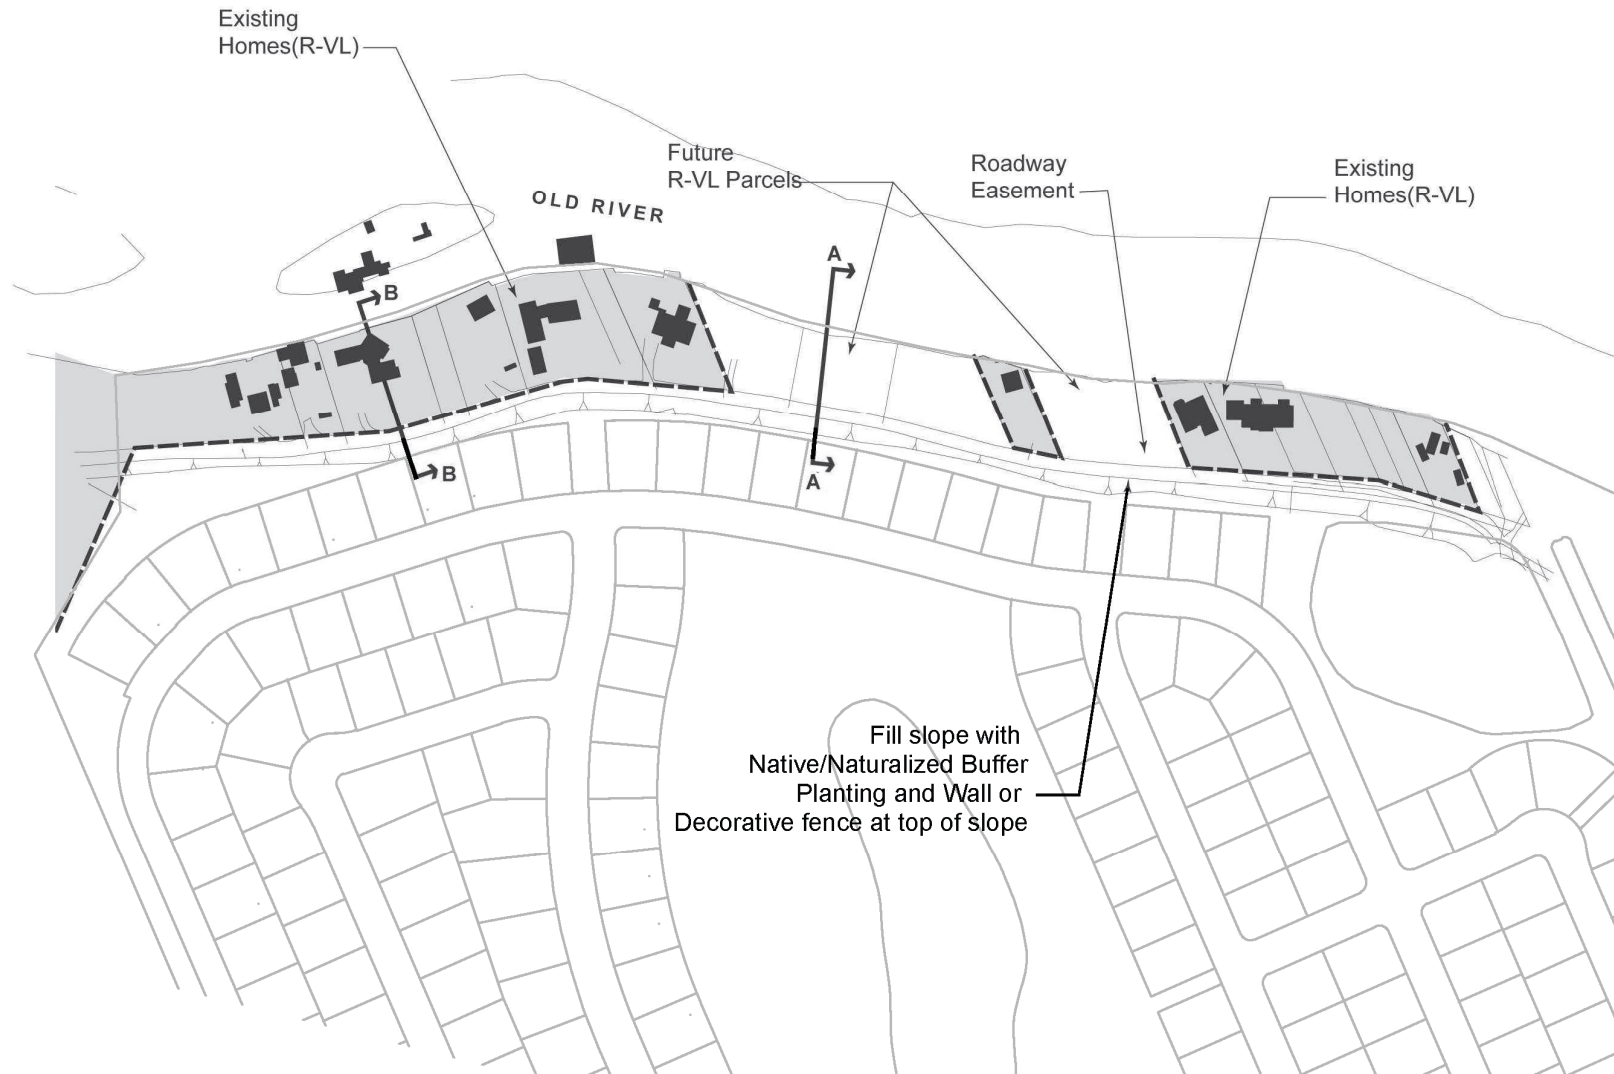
OLD RIVER HOMESITES PLAN
